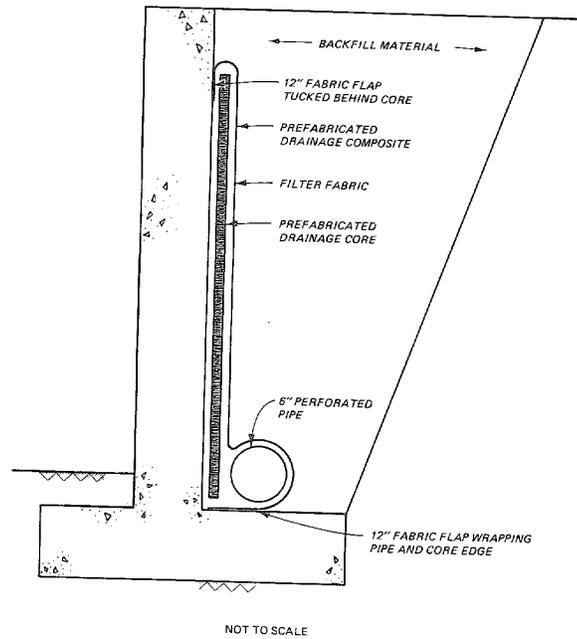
Prefabricated drainage composite used as drain adjacent to retaining wall (adapted from Carrol and Murphy 1985)
